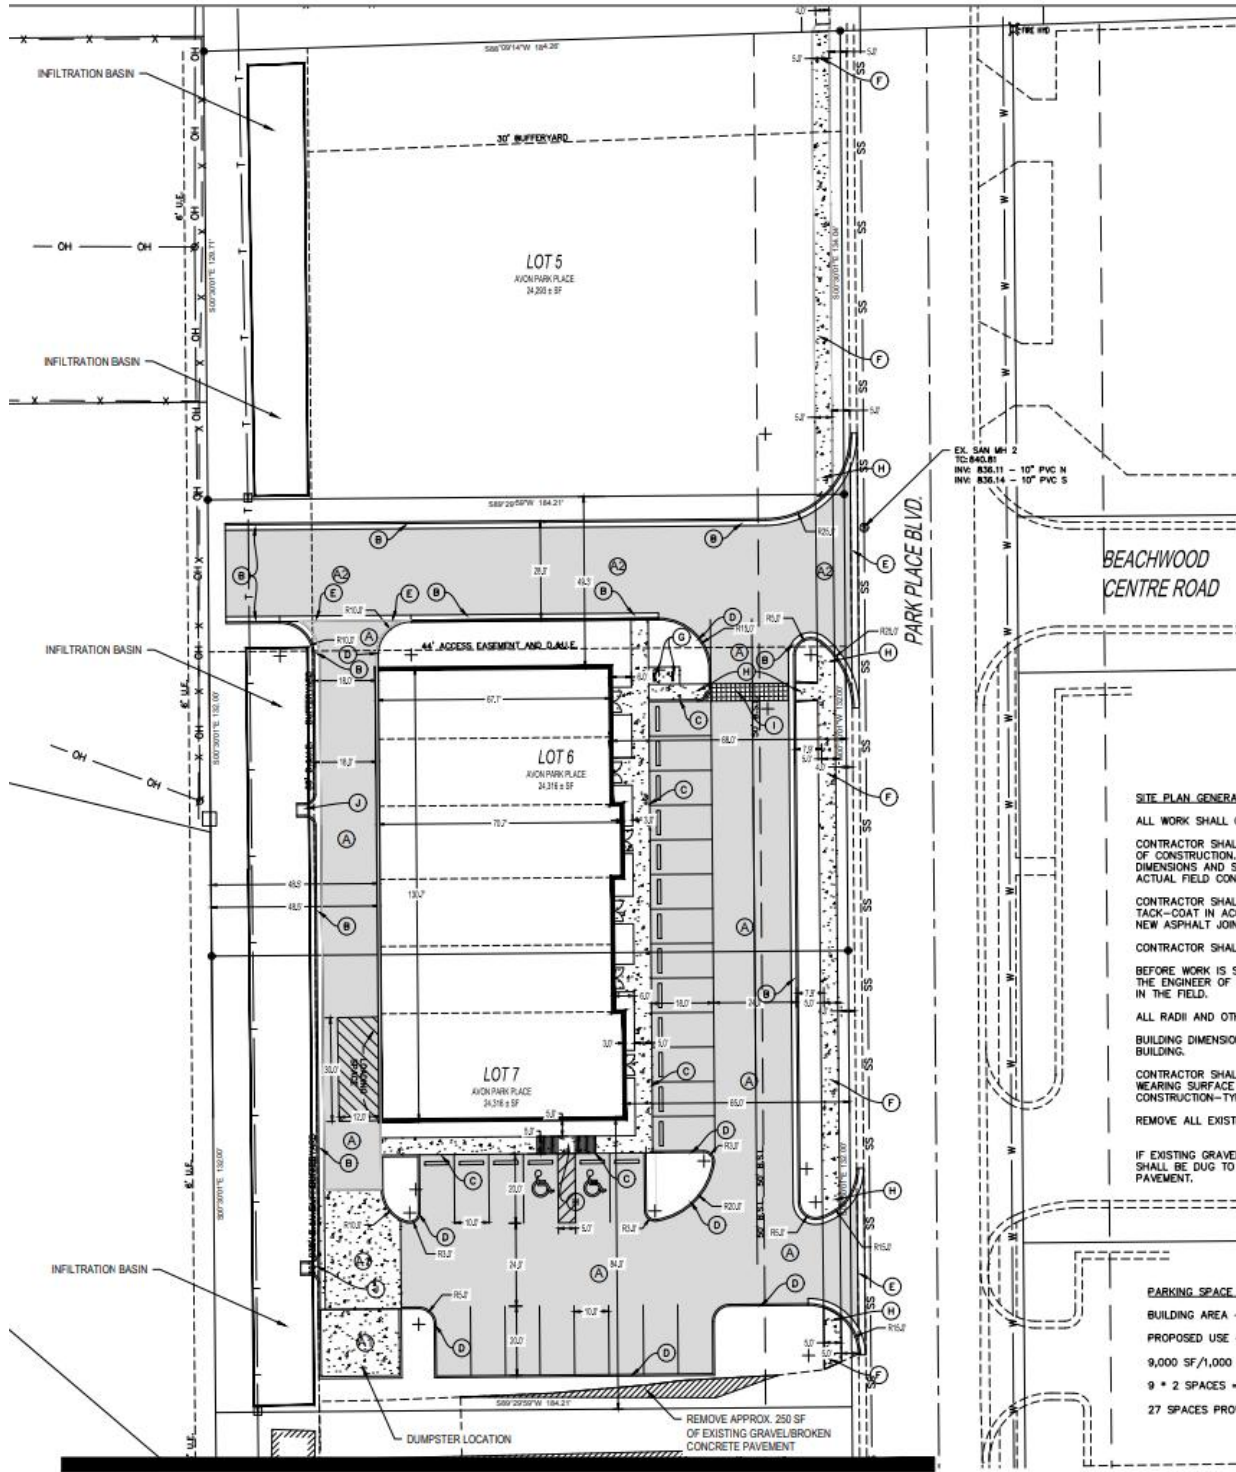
Revised Proposed Site Plan (Received 2-Jan-2026)
